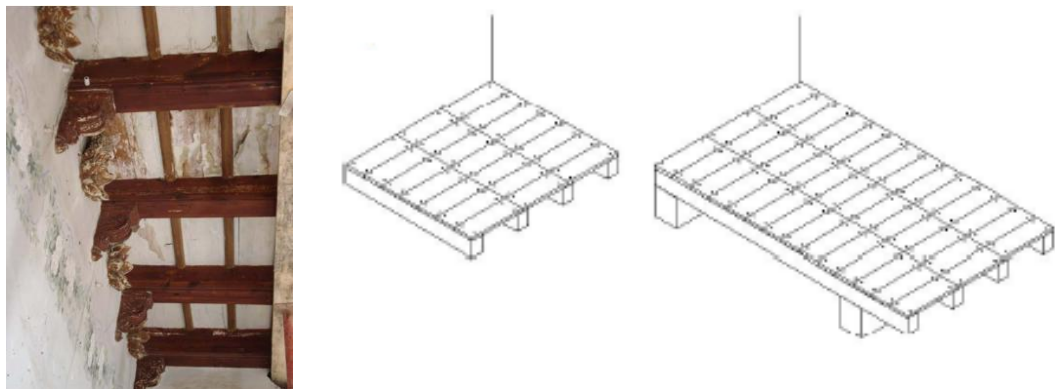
Examples of wooden layout floors. (Brignola & Podestà, 2008)
